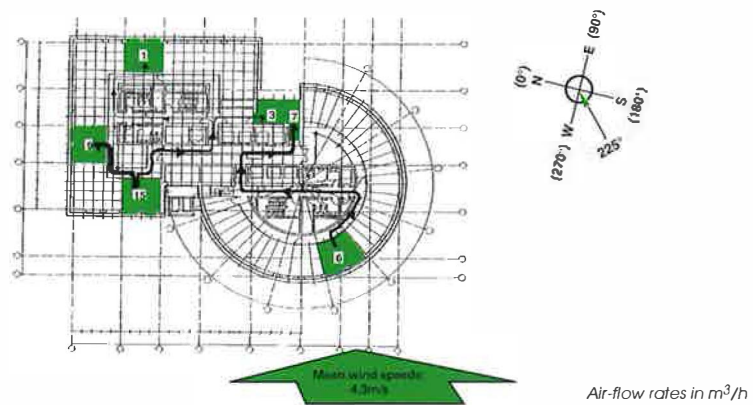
Air-flow rates through the building, office doors closed, south-west wind
